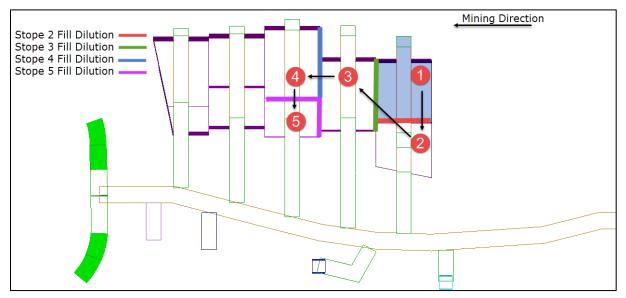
Backfill Dilution Example – AV Zone Partial 1745 Level Plan
